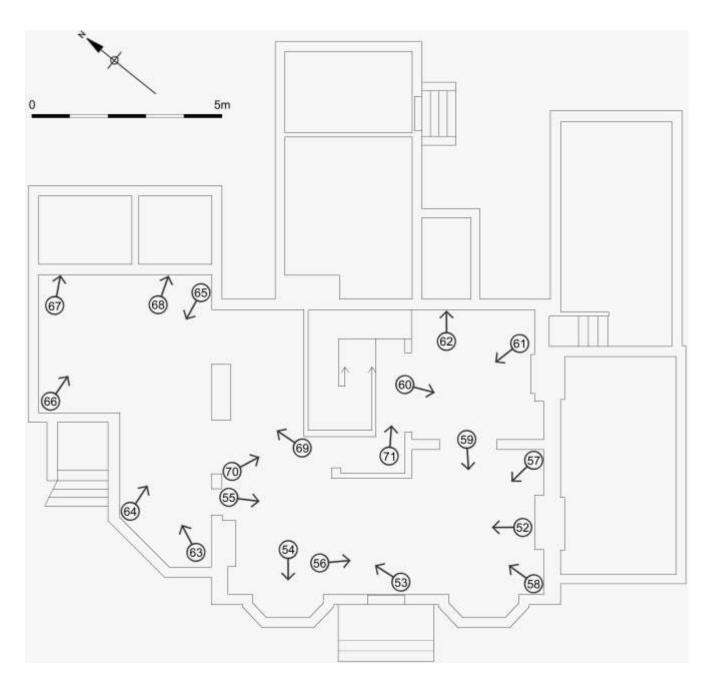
Ground floor plan of the building showing location and direction of views within the main public rooms (Figs.52-71)
